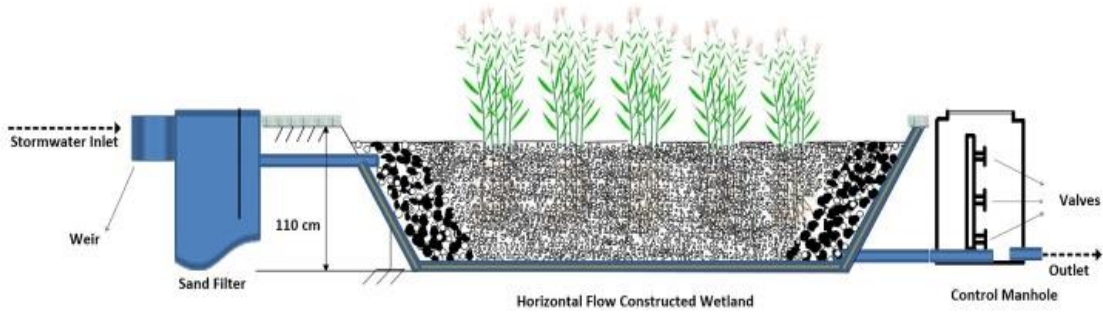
Airport stormwater runoff treatment system (constructed wetland)
